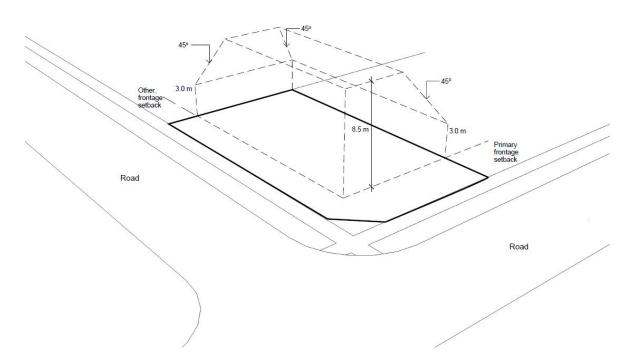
Building envelope for corner lots as required by clause 8.4.2 A3(a) and clause 8.5.1 A2(a)
